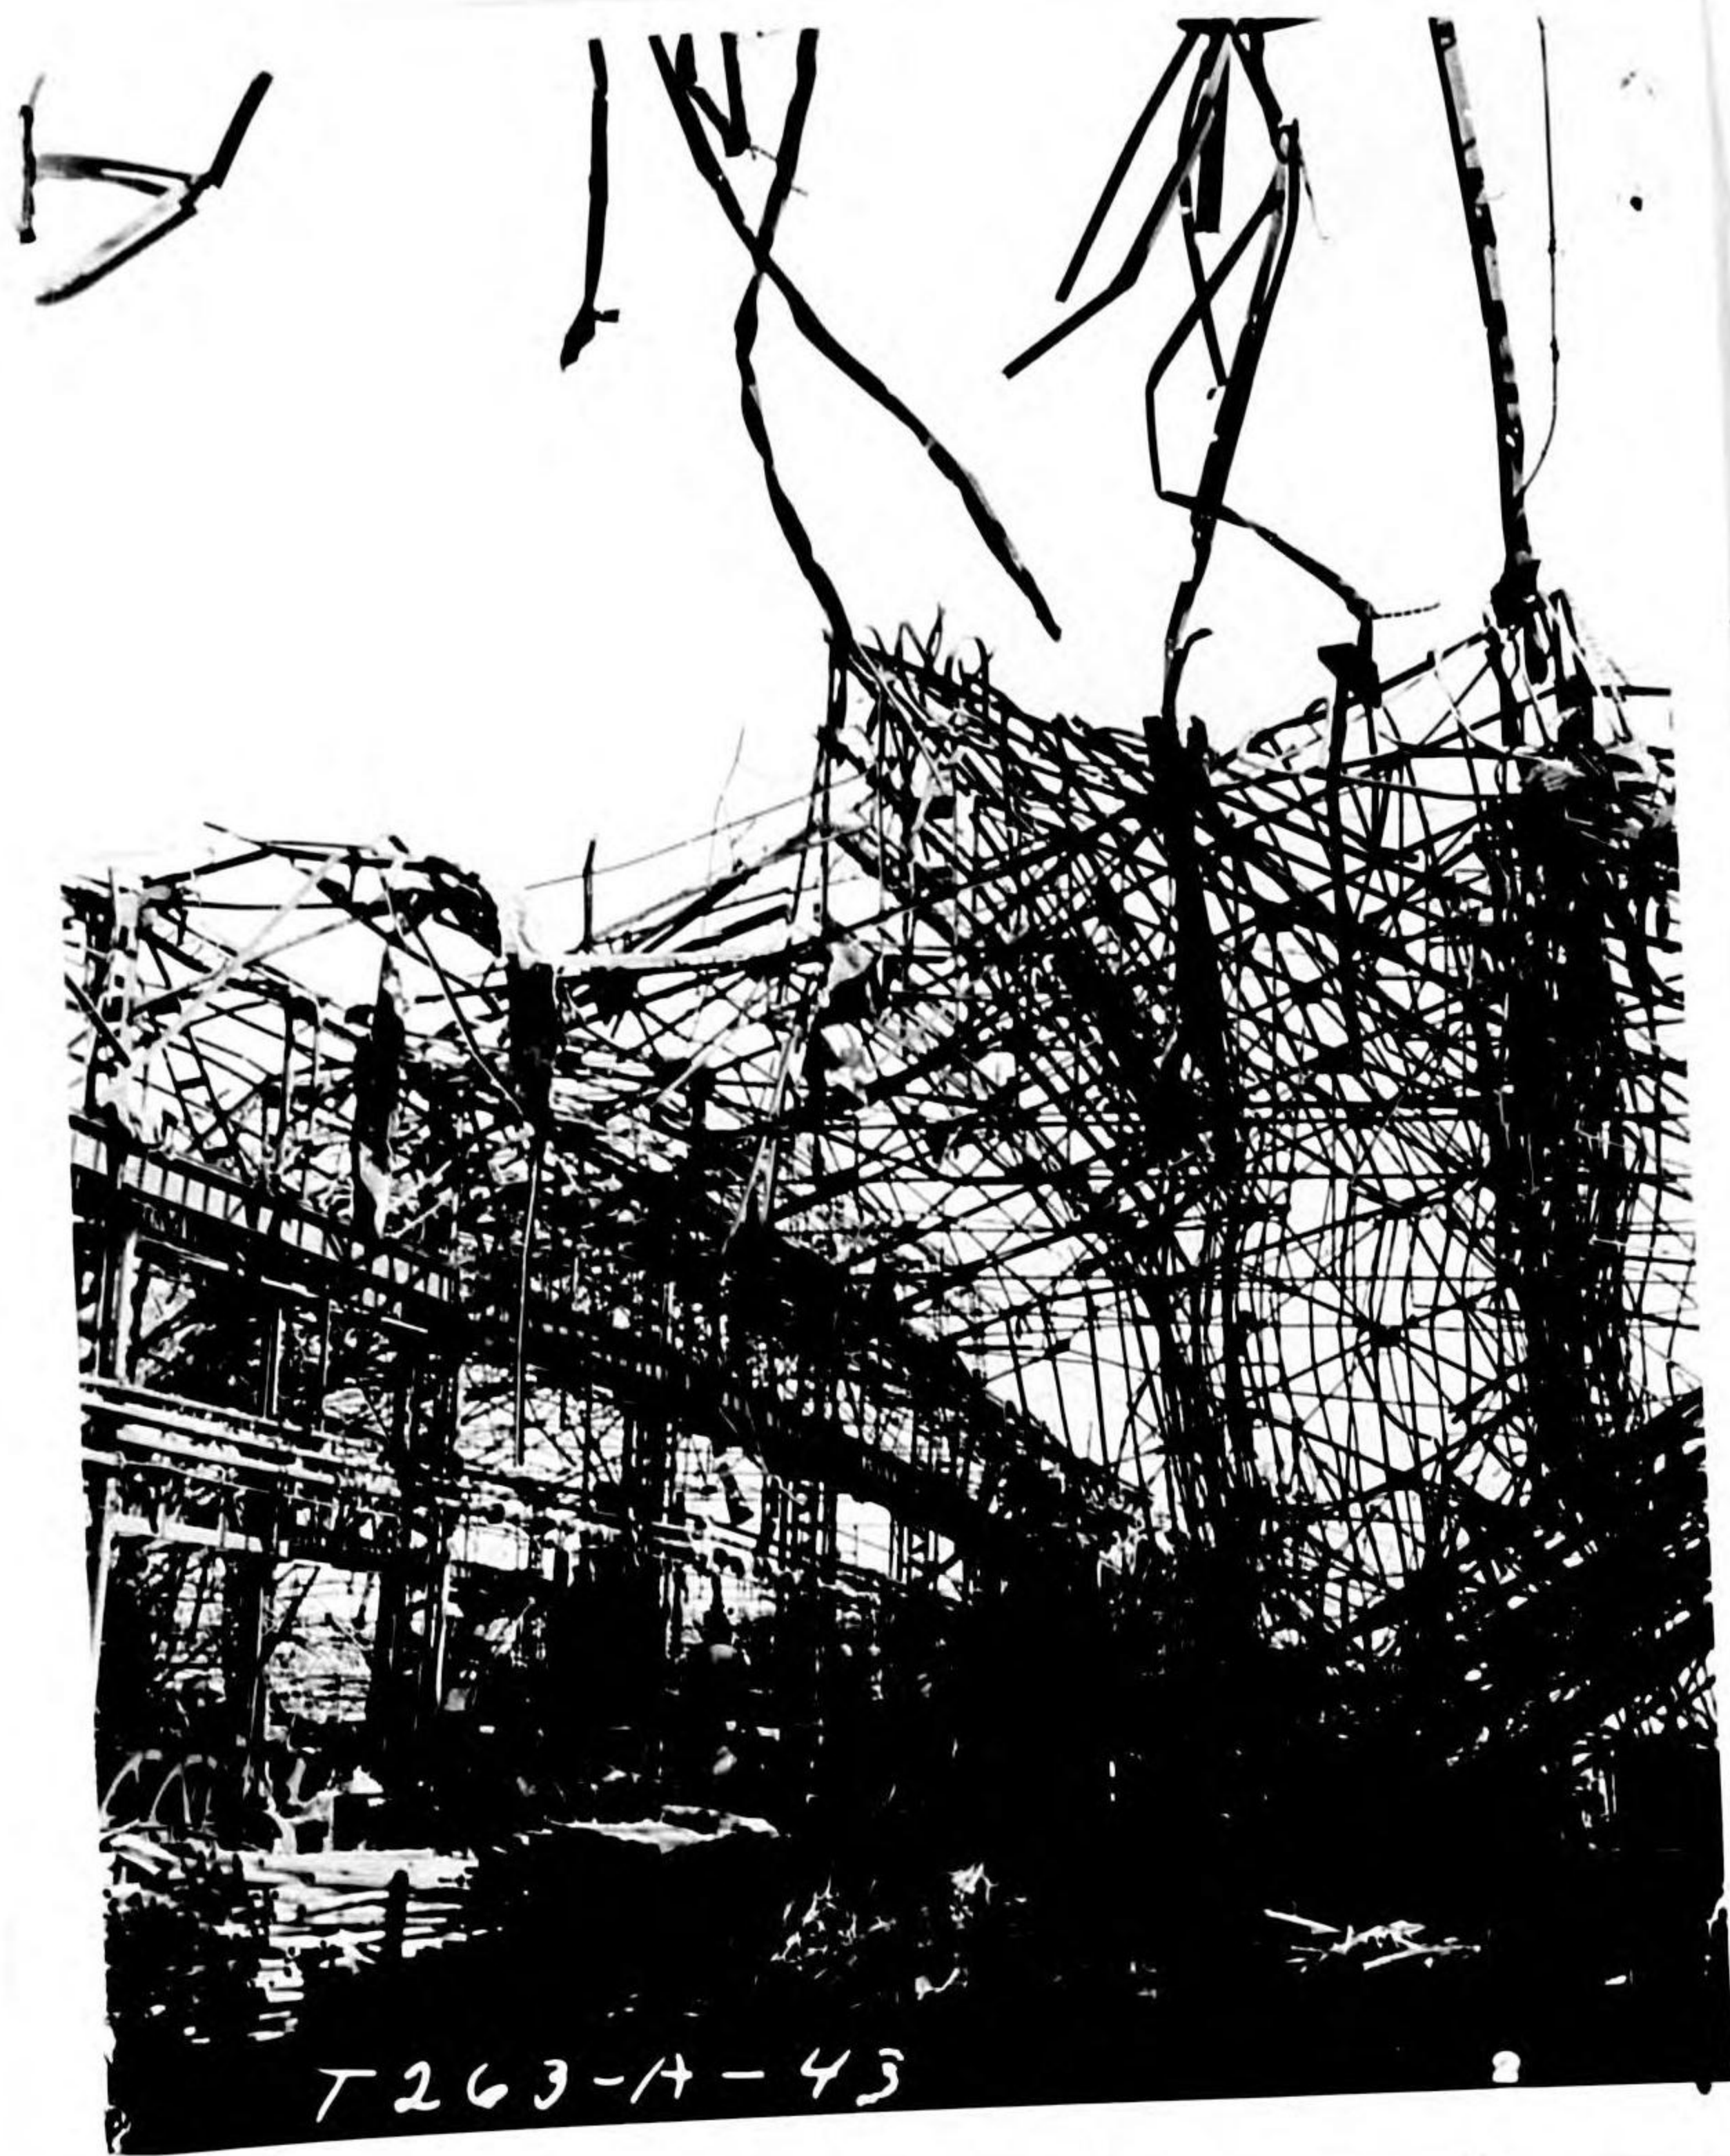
Bldg. 51, Bomb 77. Structural roof damage.
